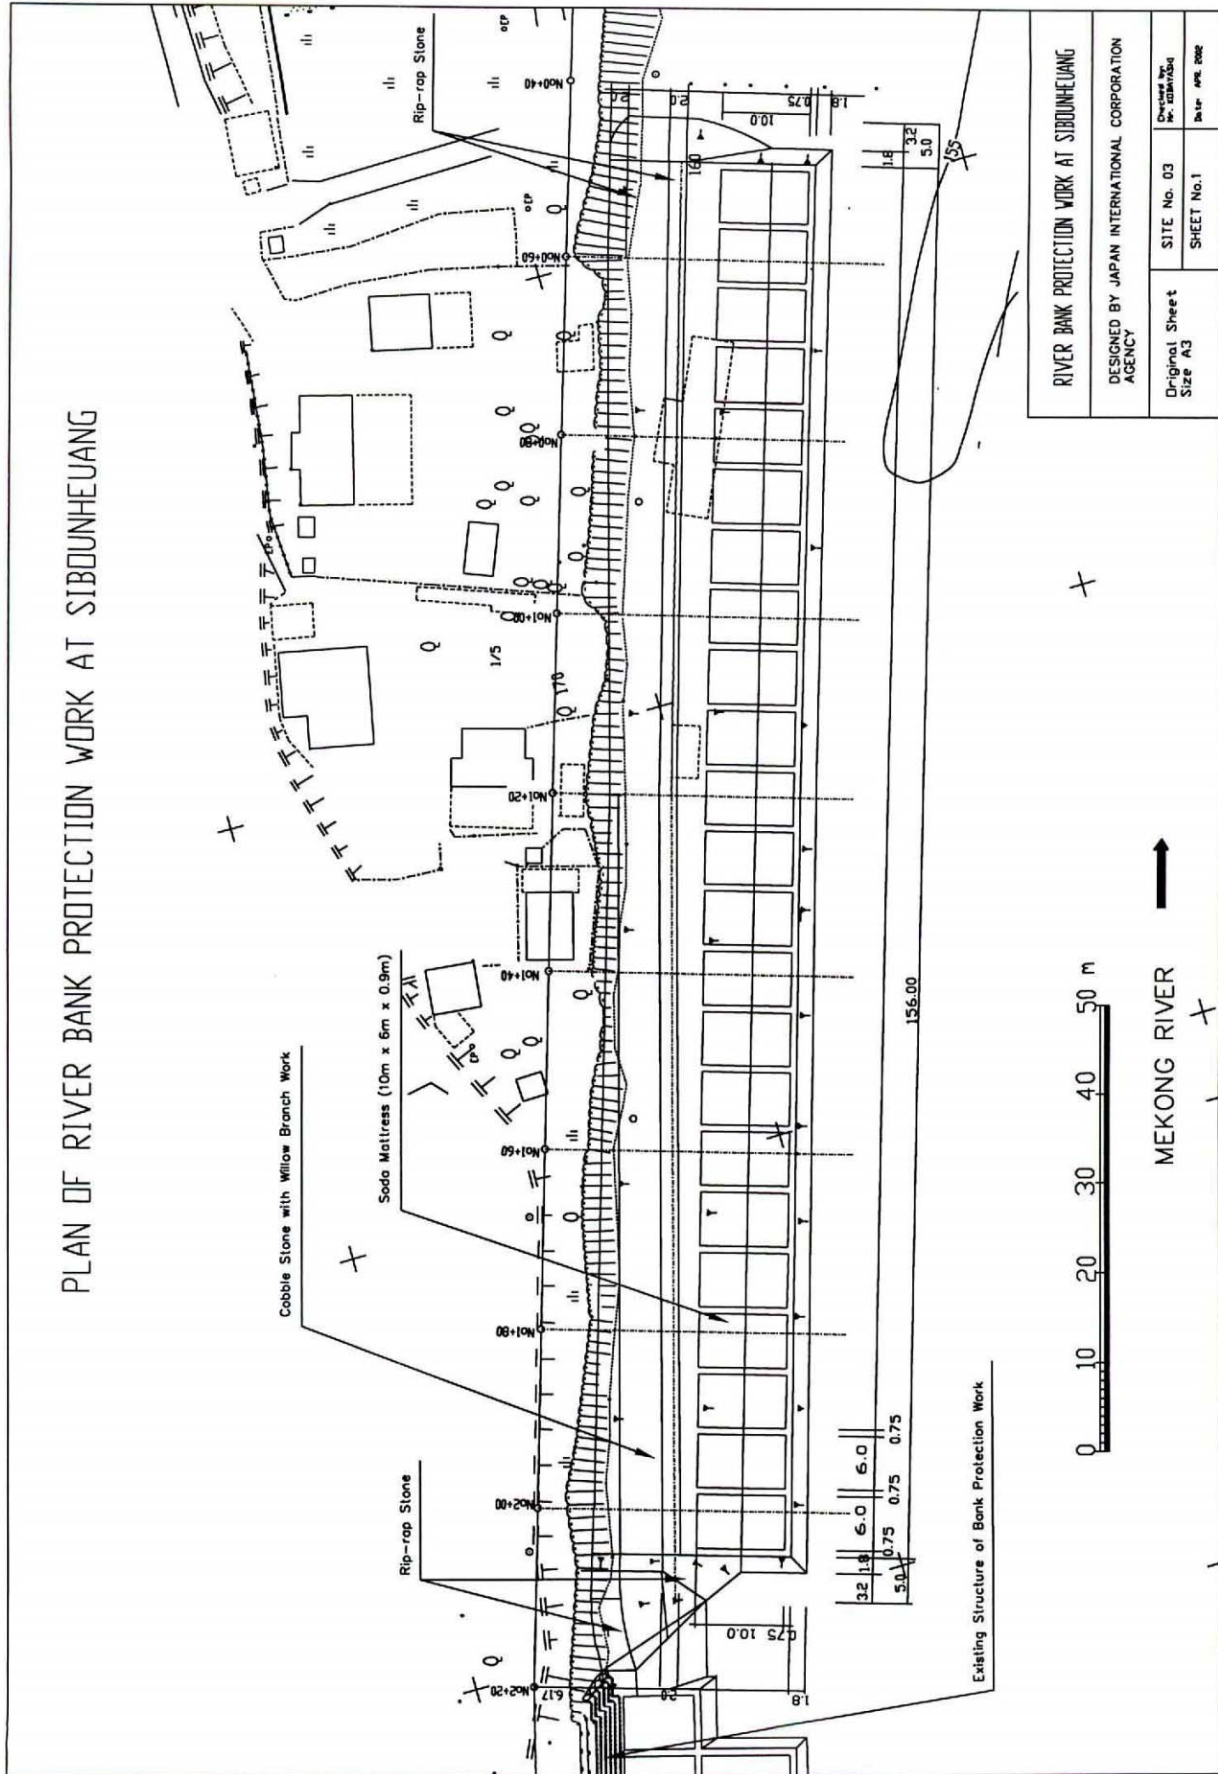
Plan of River Bank Protection Work at Sibounheuang Site
